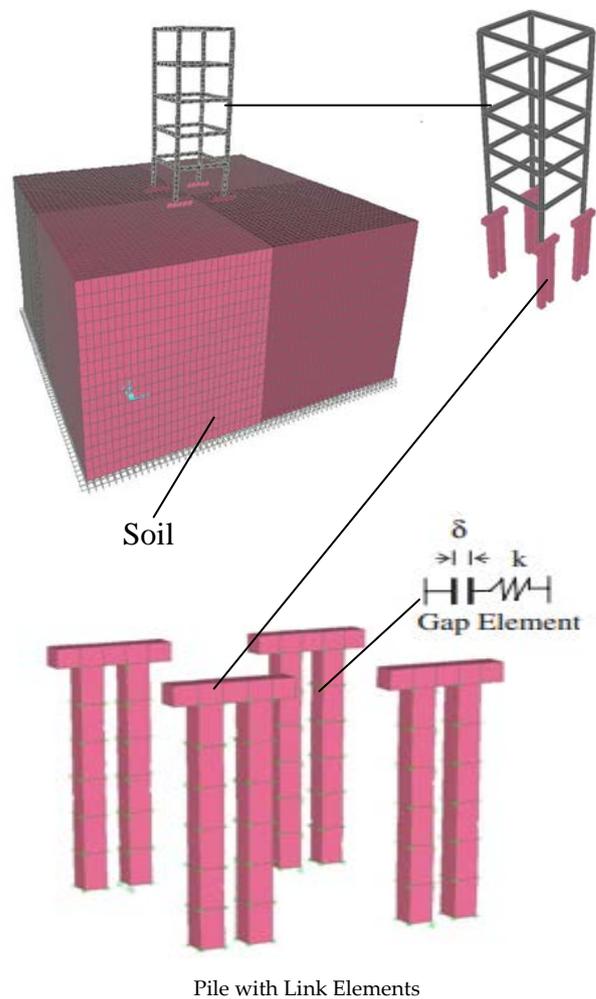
3D FINITE ELEMENT MODEL OF SOIL PILE FRAME SYSTEM
